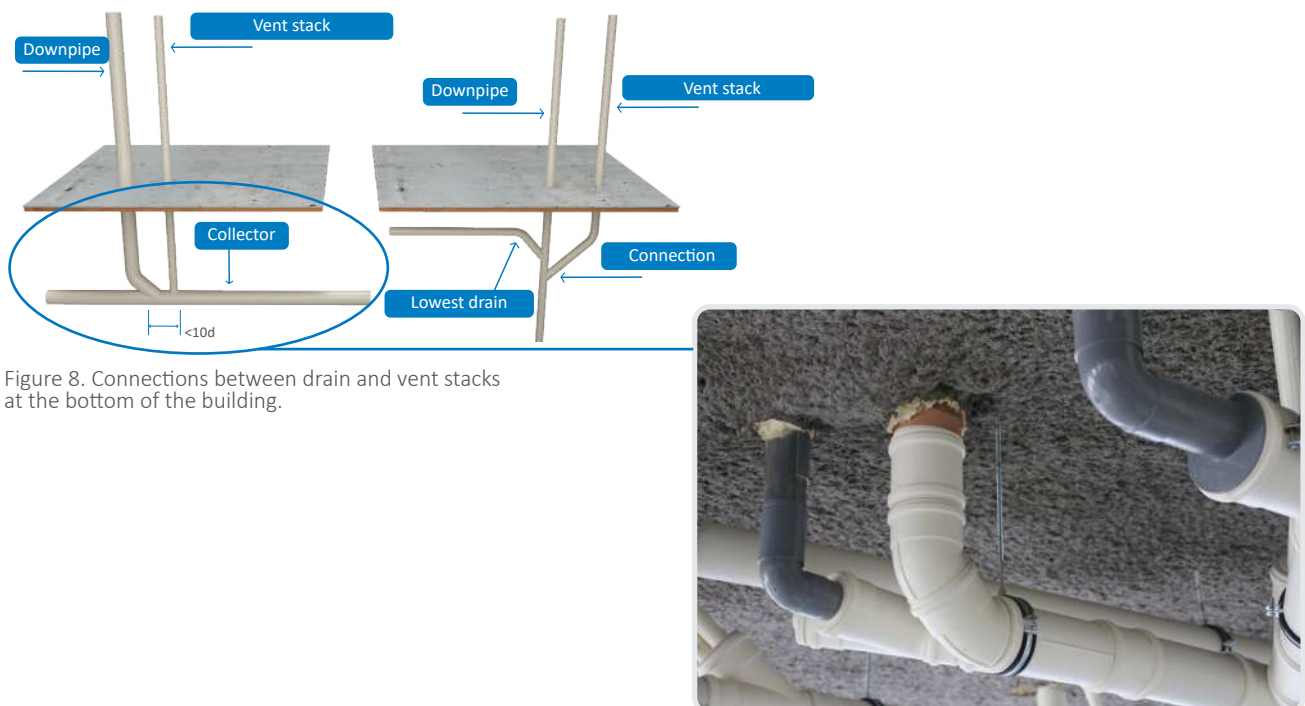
Connections between drain and vent stacks at the bottom of the building.
